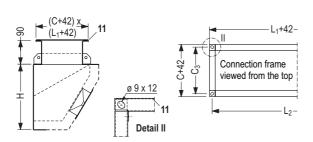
Semi-trapezoidal displacement outlet - Dimensions
